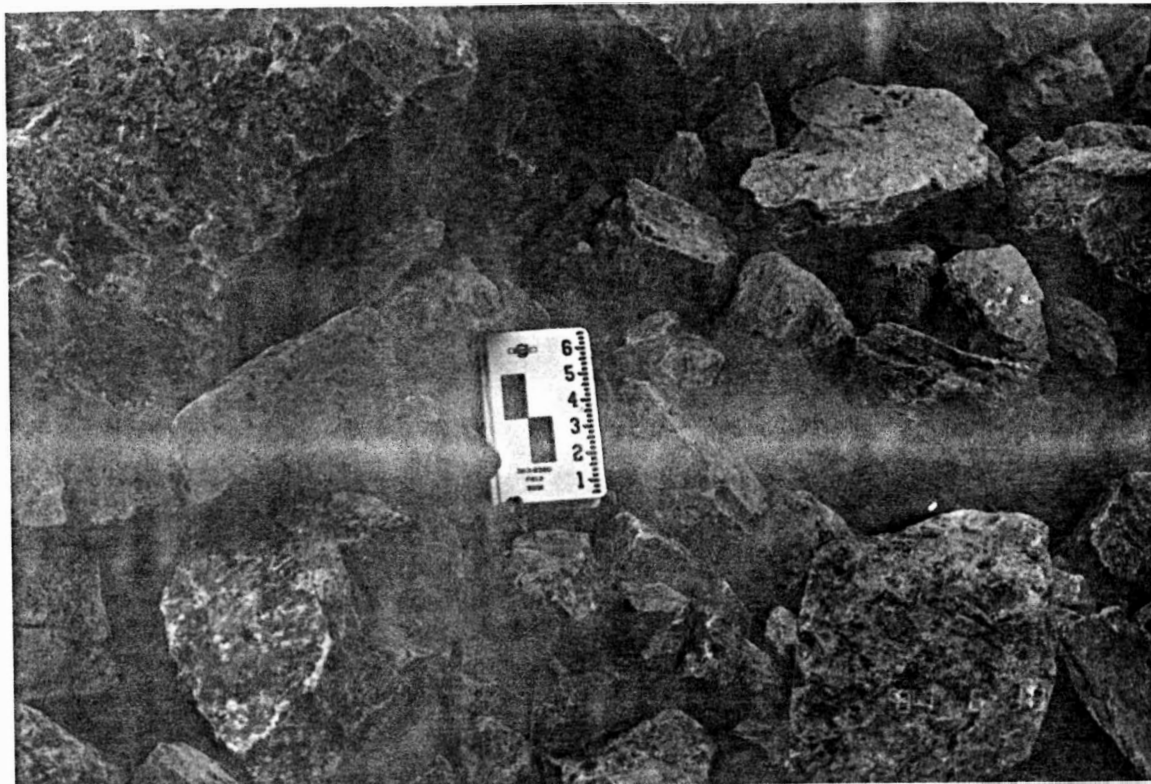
Smaller sized rock is locally encountered. Location - approximately 5 m above valley floor.
